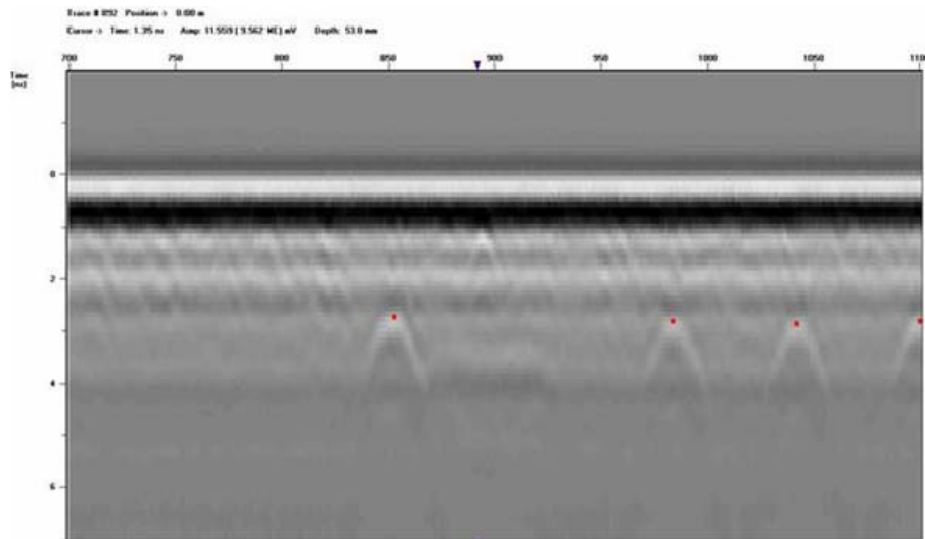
GPR Scan of Concrete Pavement Transverse Joint
